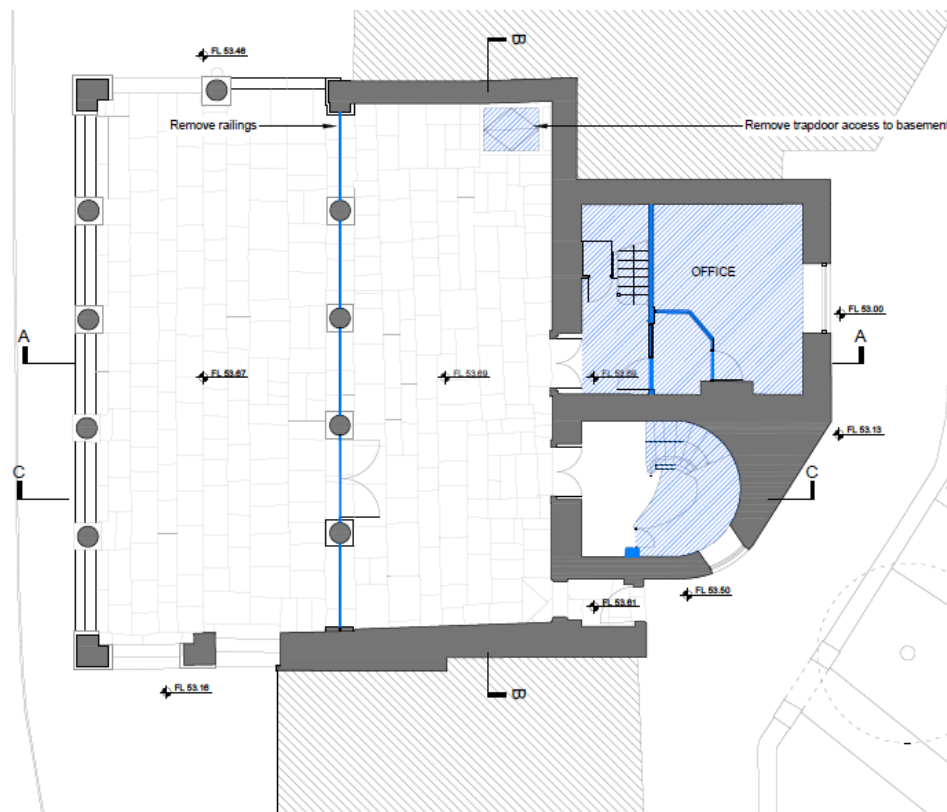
Proposed interventions ground floor (Reddy Architecture and Urbanism)
